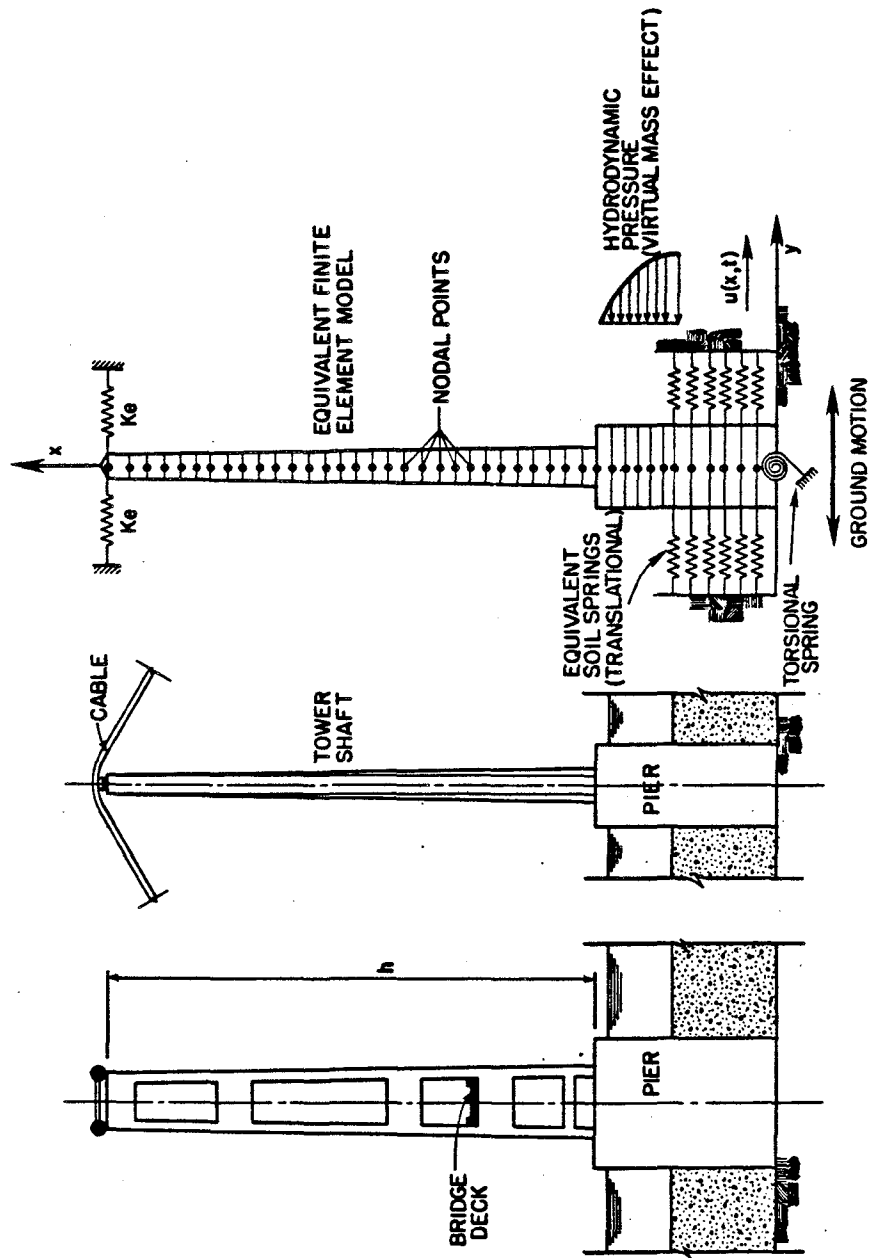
TYPICAL SUSPENSION BRIDGE TOWER-PIER SYSTEM ; DEFINITION DIAGRAM
